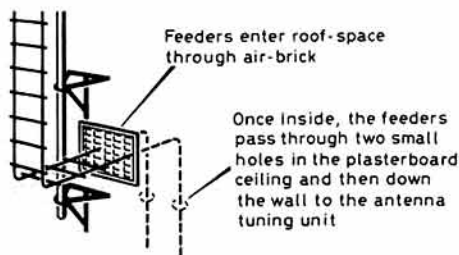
As an alternative to coming through a window frame, open-wire feeders can enter the roof space via an "air-brick" before coming down through the ceiling of the shack
